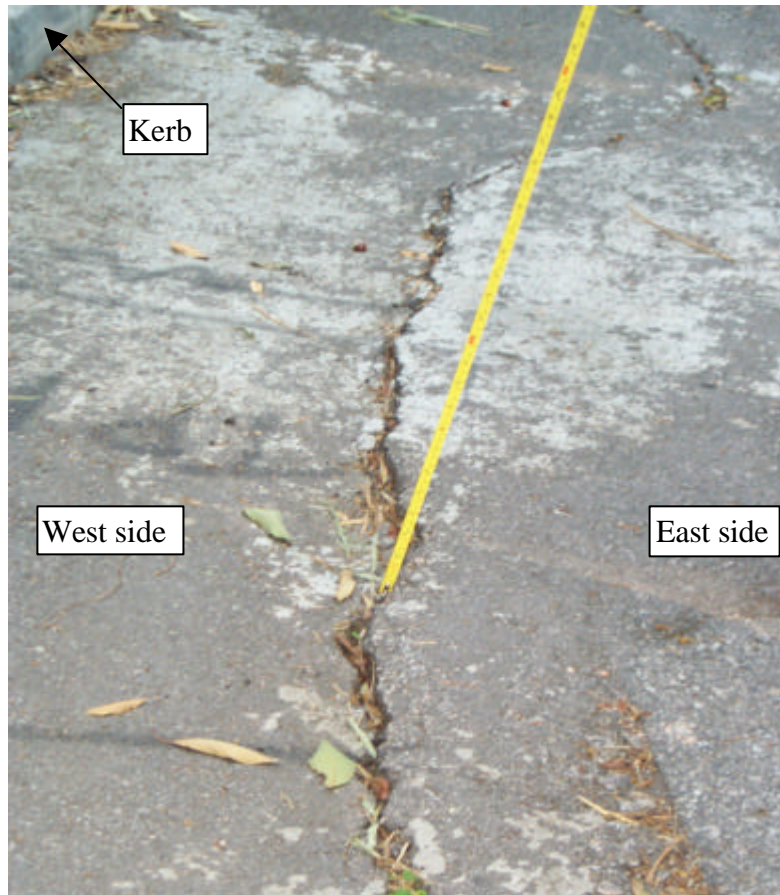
Differential Settlement of Road Pavement across Crack No. 1
